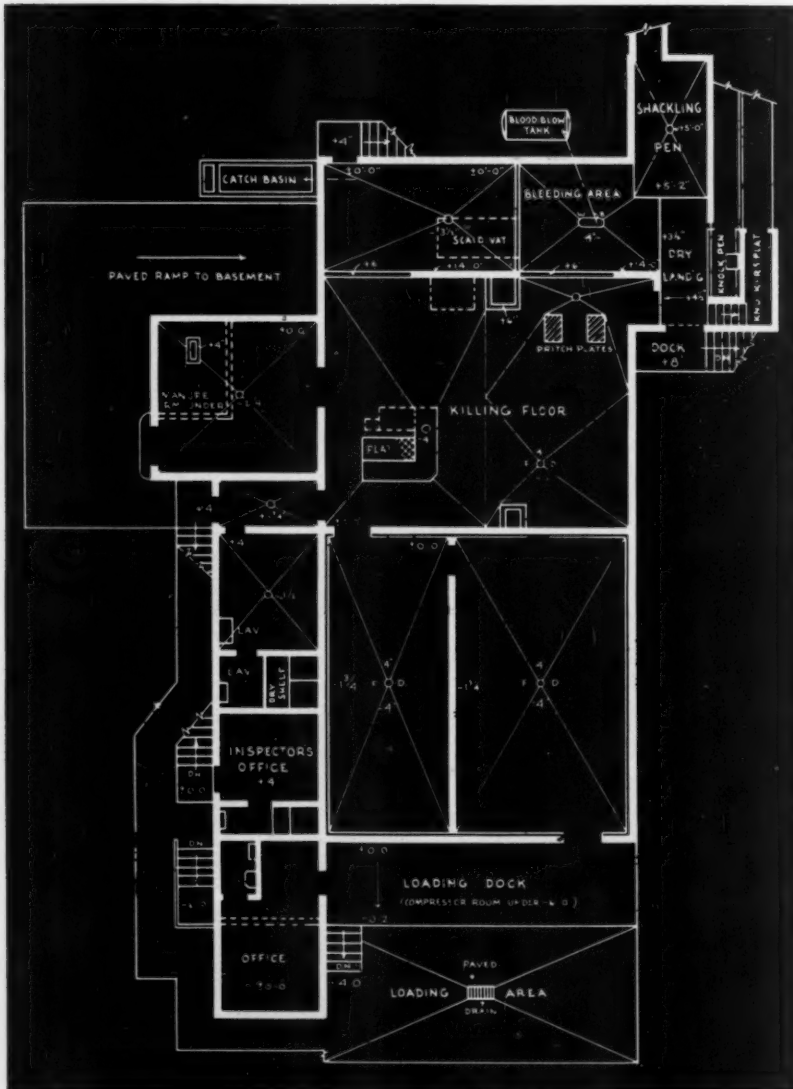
HOW THE BASIC PLAN WAS ALTERED FOR FEDERAL INSPECTION
